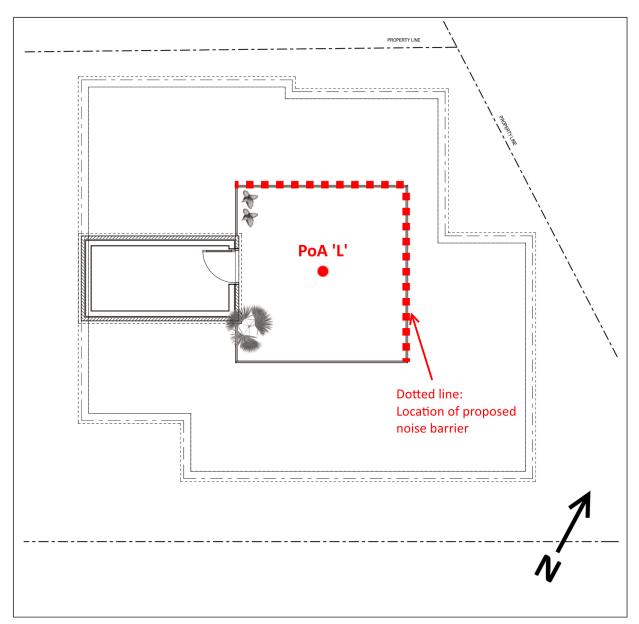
Site plan showing location of Point of Reception POA 'L' on the rooftop of Building 'A'.
